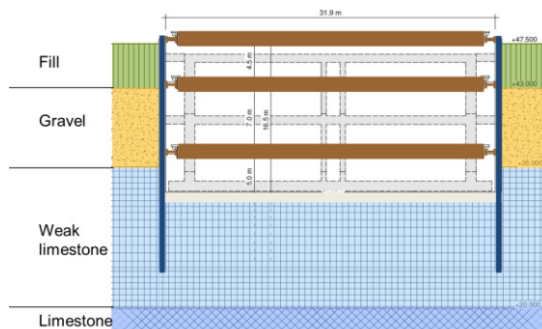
Cross section of the building pit with struts and girders. The final construction is represented by dashed lines.
